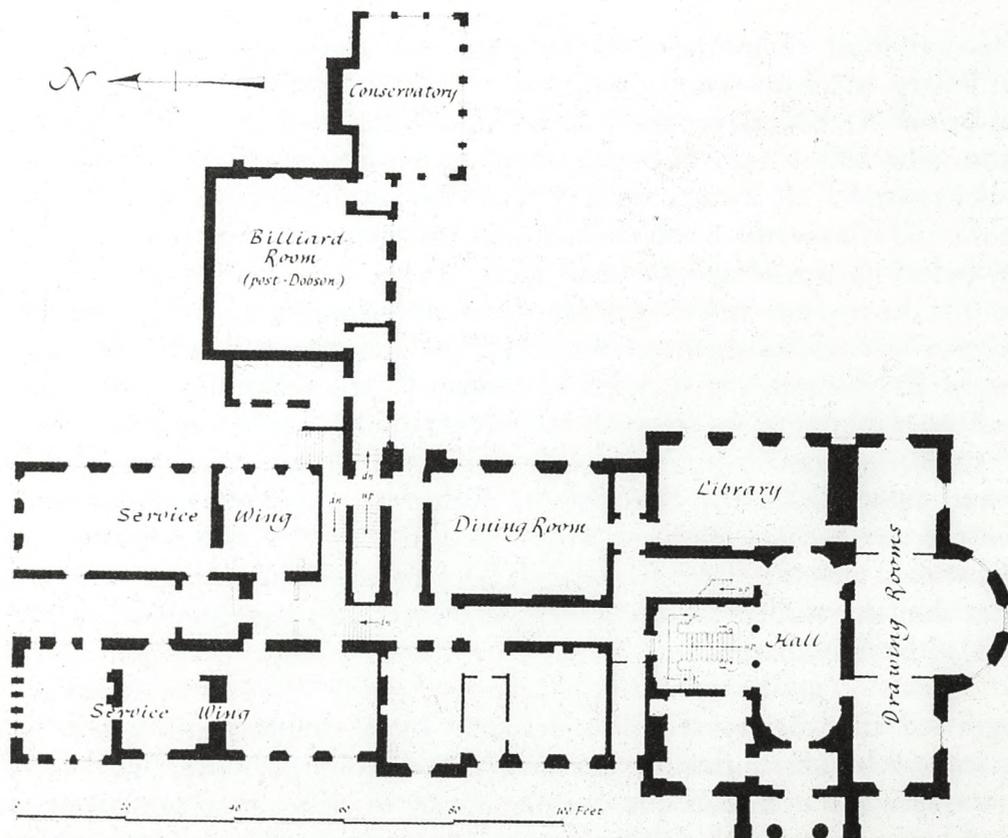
John Dobson: Longhirst House, Northumberland, 1824–8, plan
